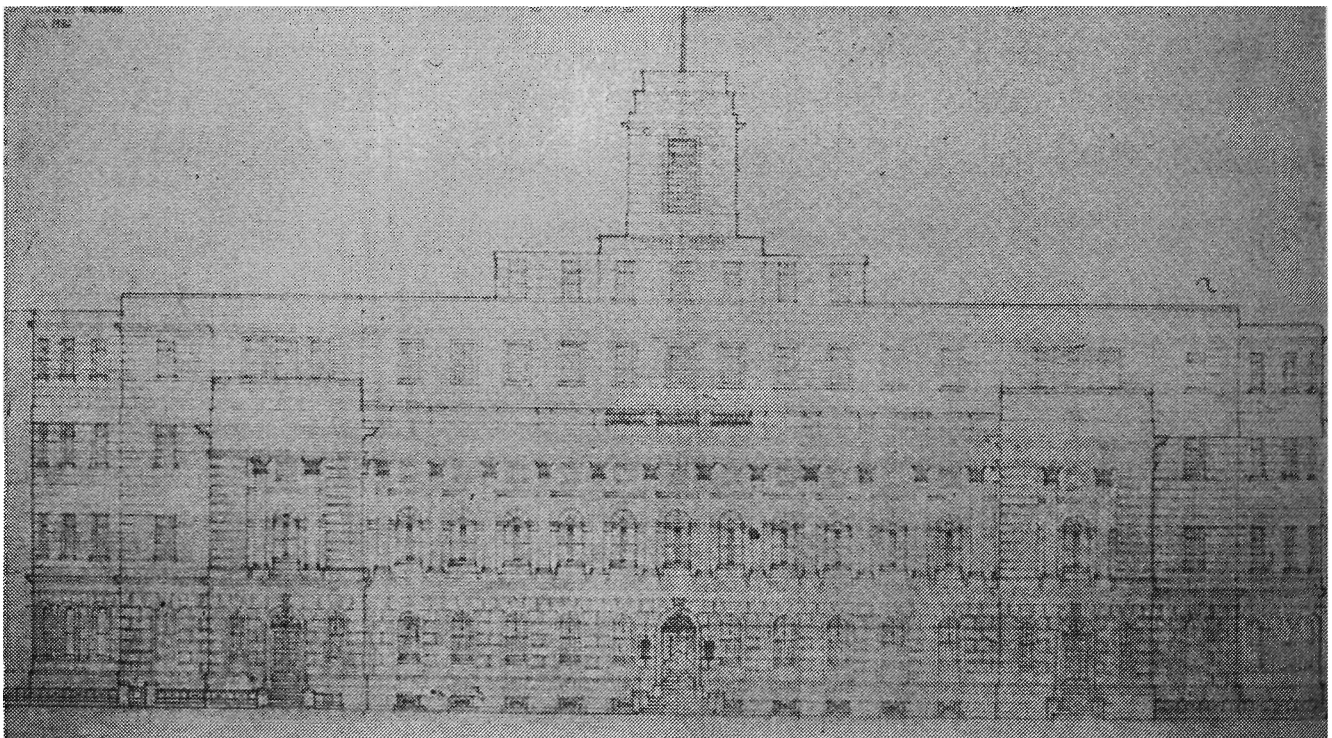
William Street elevation proposed Police Courts 1936 (QSA PD90.4/3)
